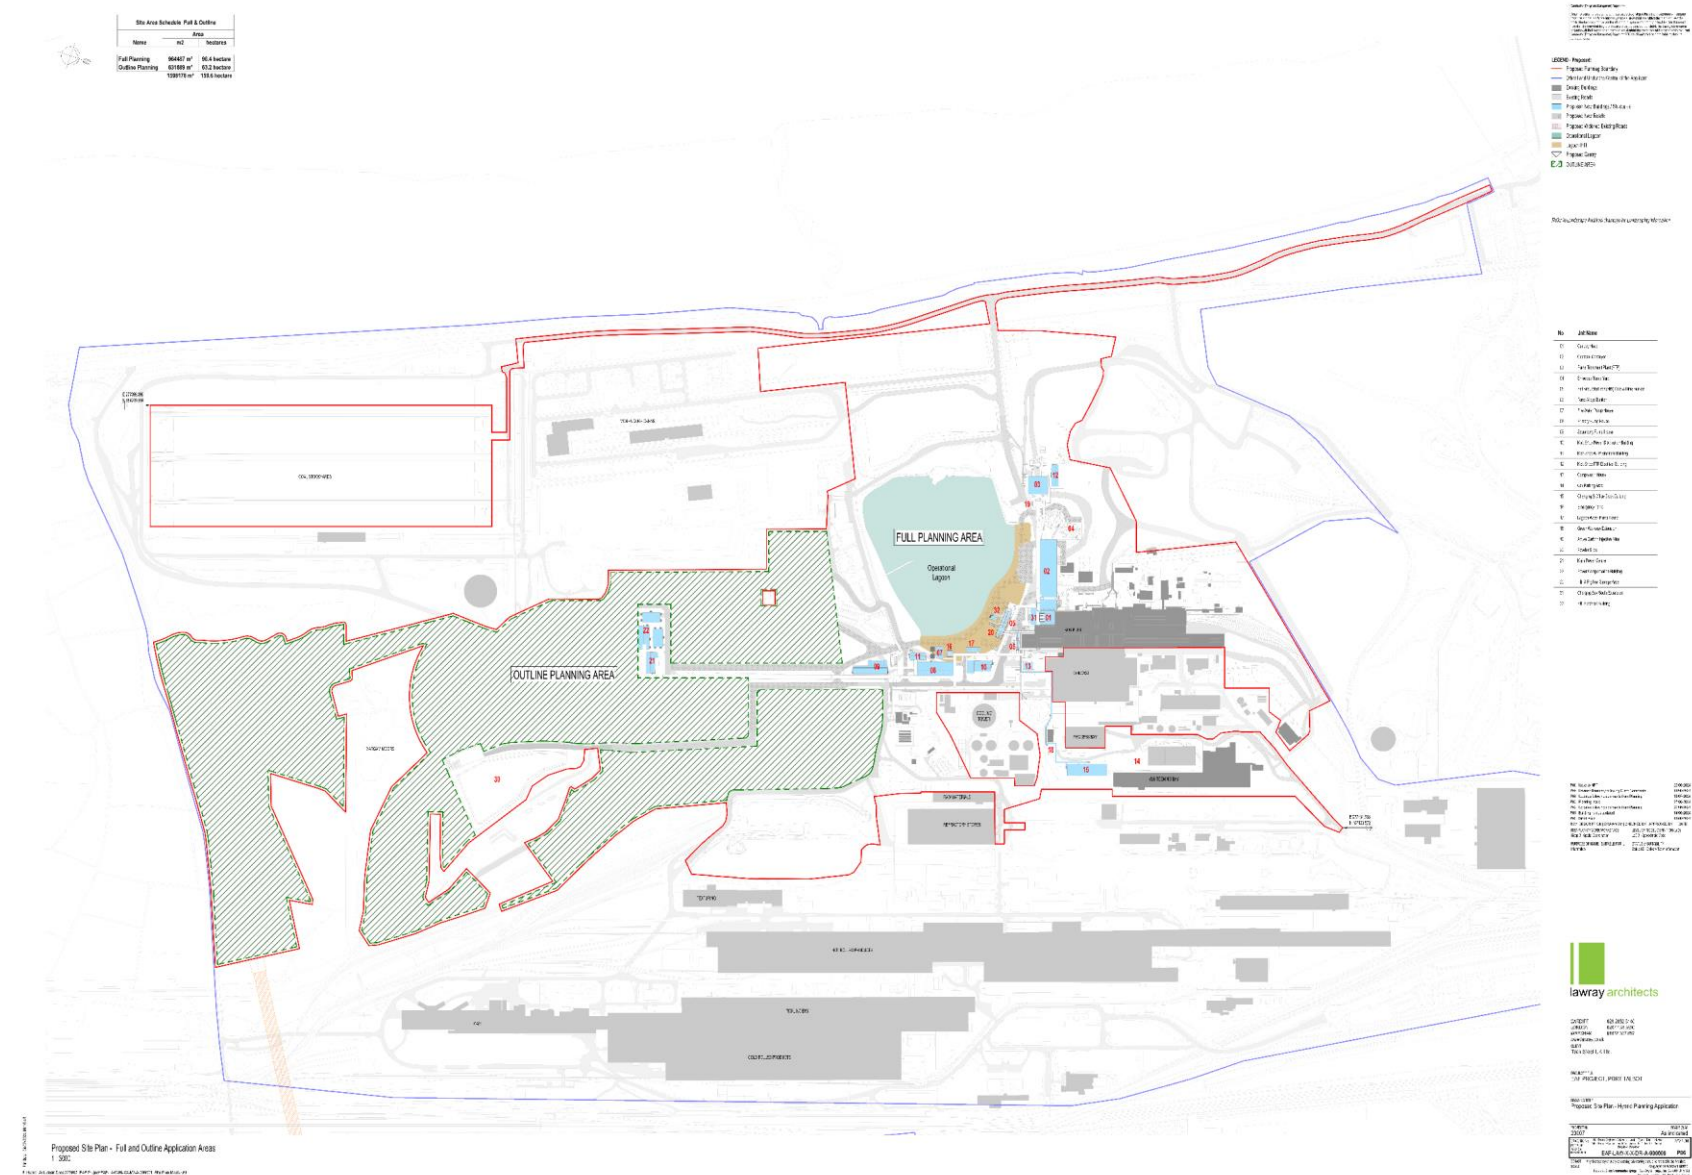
Proposed Site Plan – Hybrid Planning Application EAF-LAW-X-X-DR-A-900009 P06
